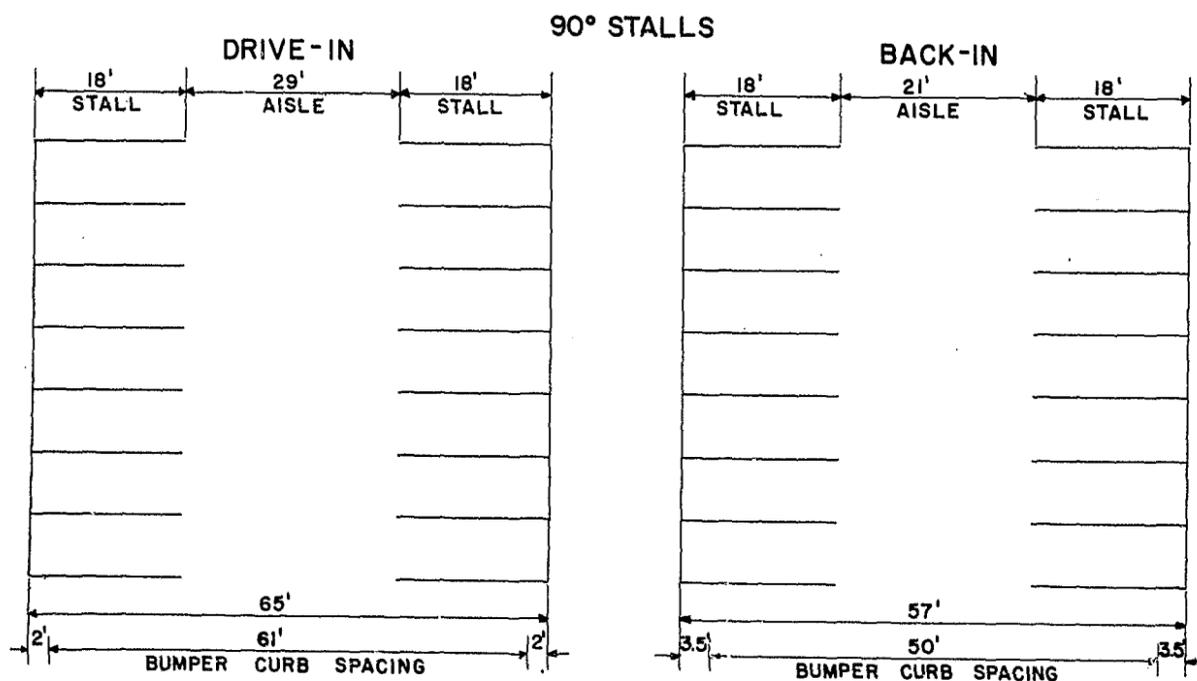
Minimum dimensions for parking area layout, 90° stalls.
